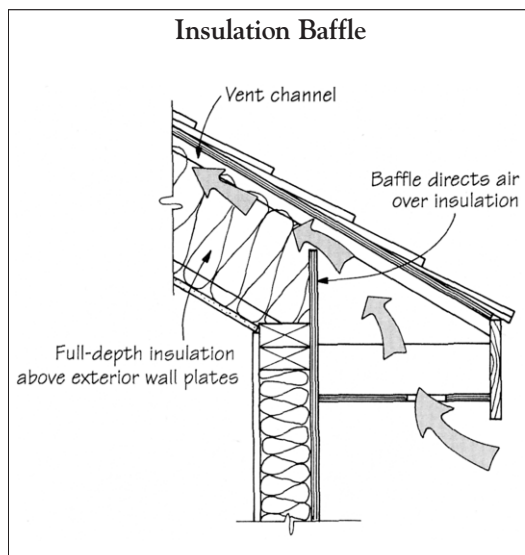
Install a baffle at the exterior wall plates to prevent air from blowing through the end of the batt.
